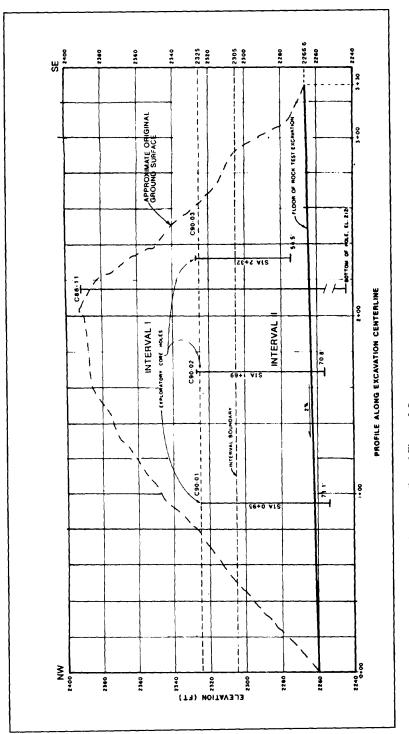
Profile along the excavation centerline of Figure 6-3
